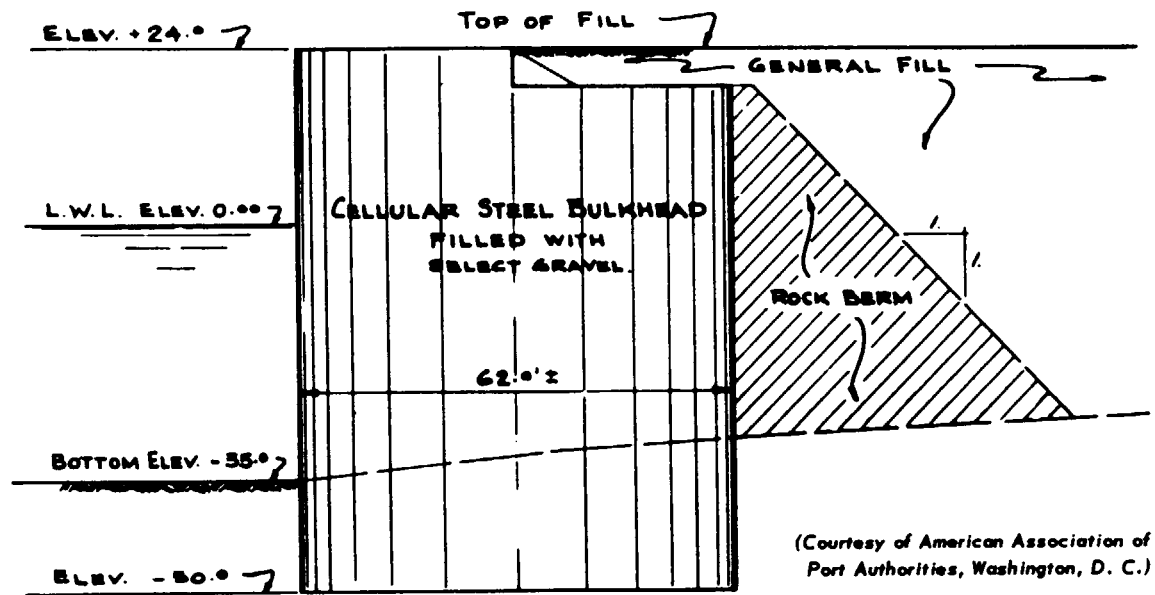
Solid fill-type wharf construction with cellular steel bulkhead
